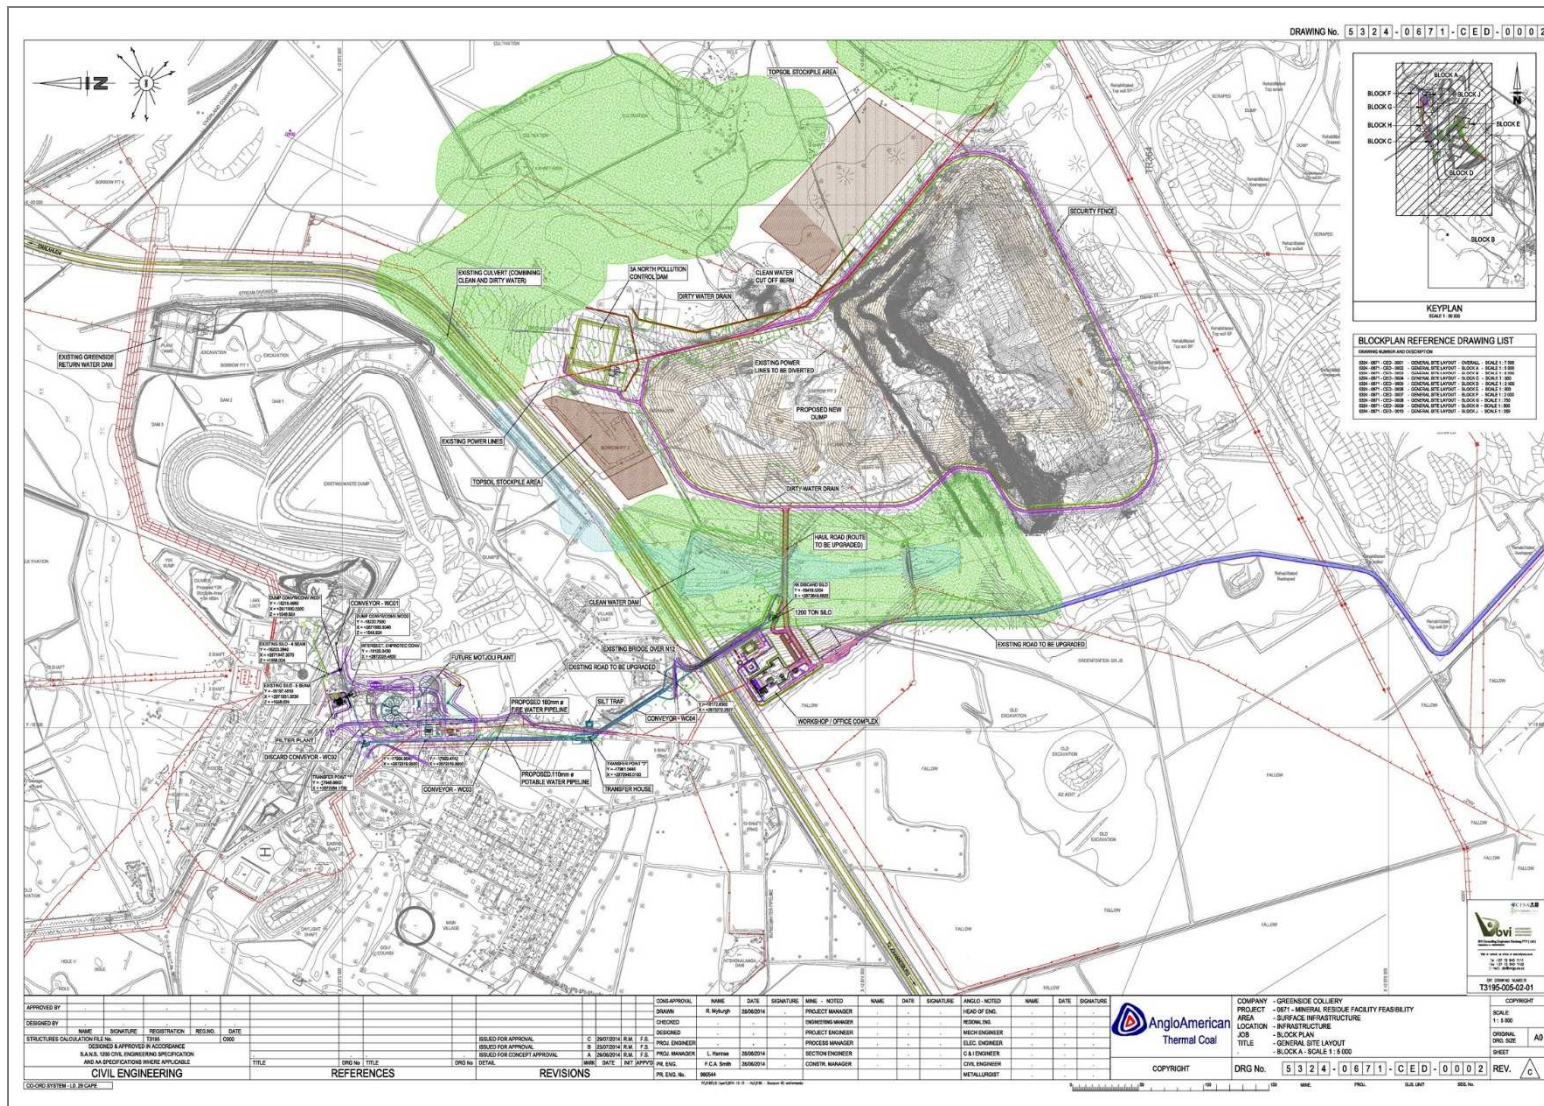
Master Layout Plan of the Greenside Colliery Proposed New Discard Facility Project
